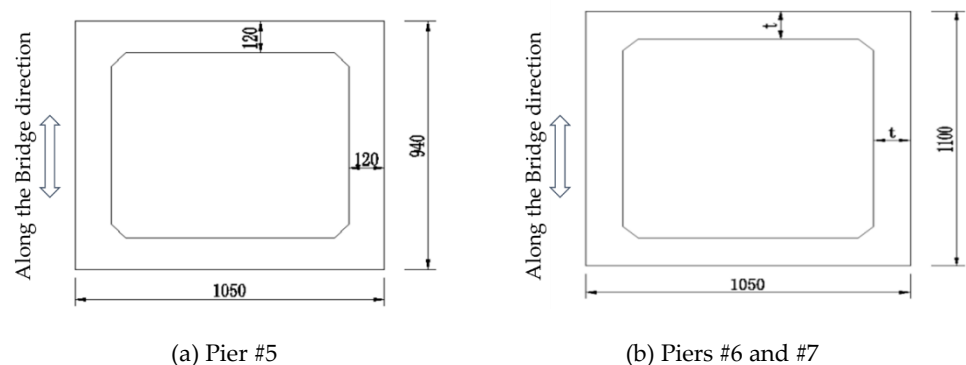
Section of ordinary reinforced concrete hollow thin-walled piers (Unit: cm)
